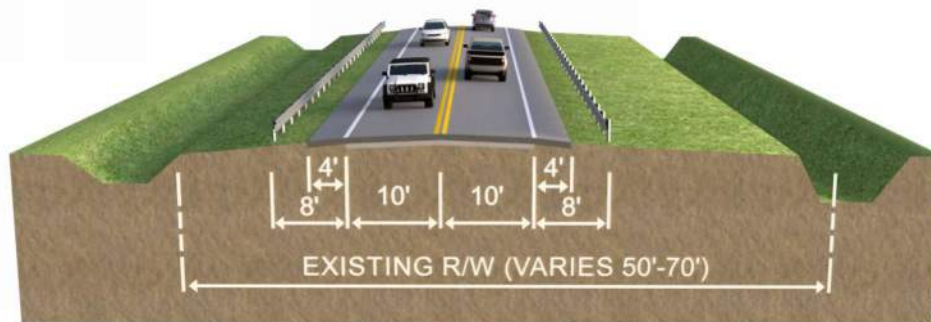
SR 70 – Existing Roadway Typical Section One
